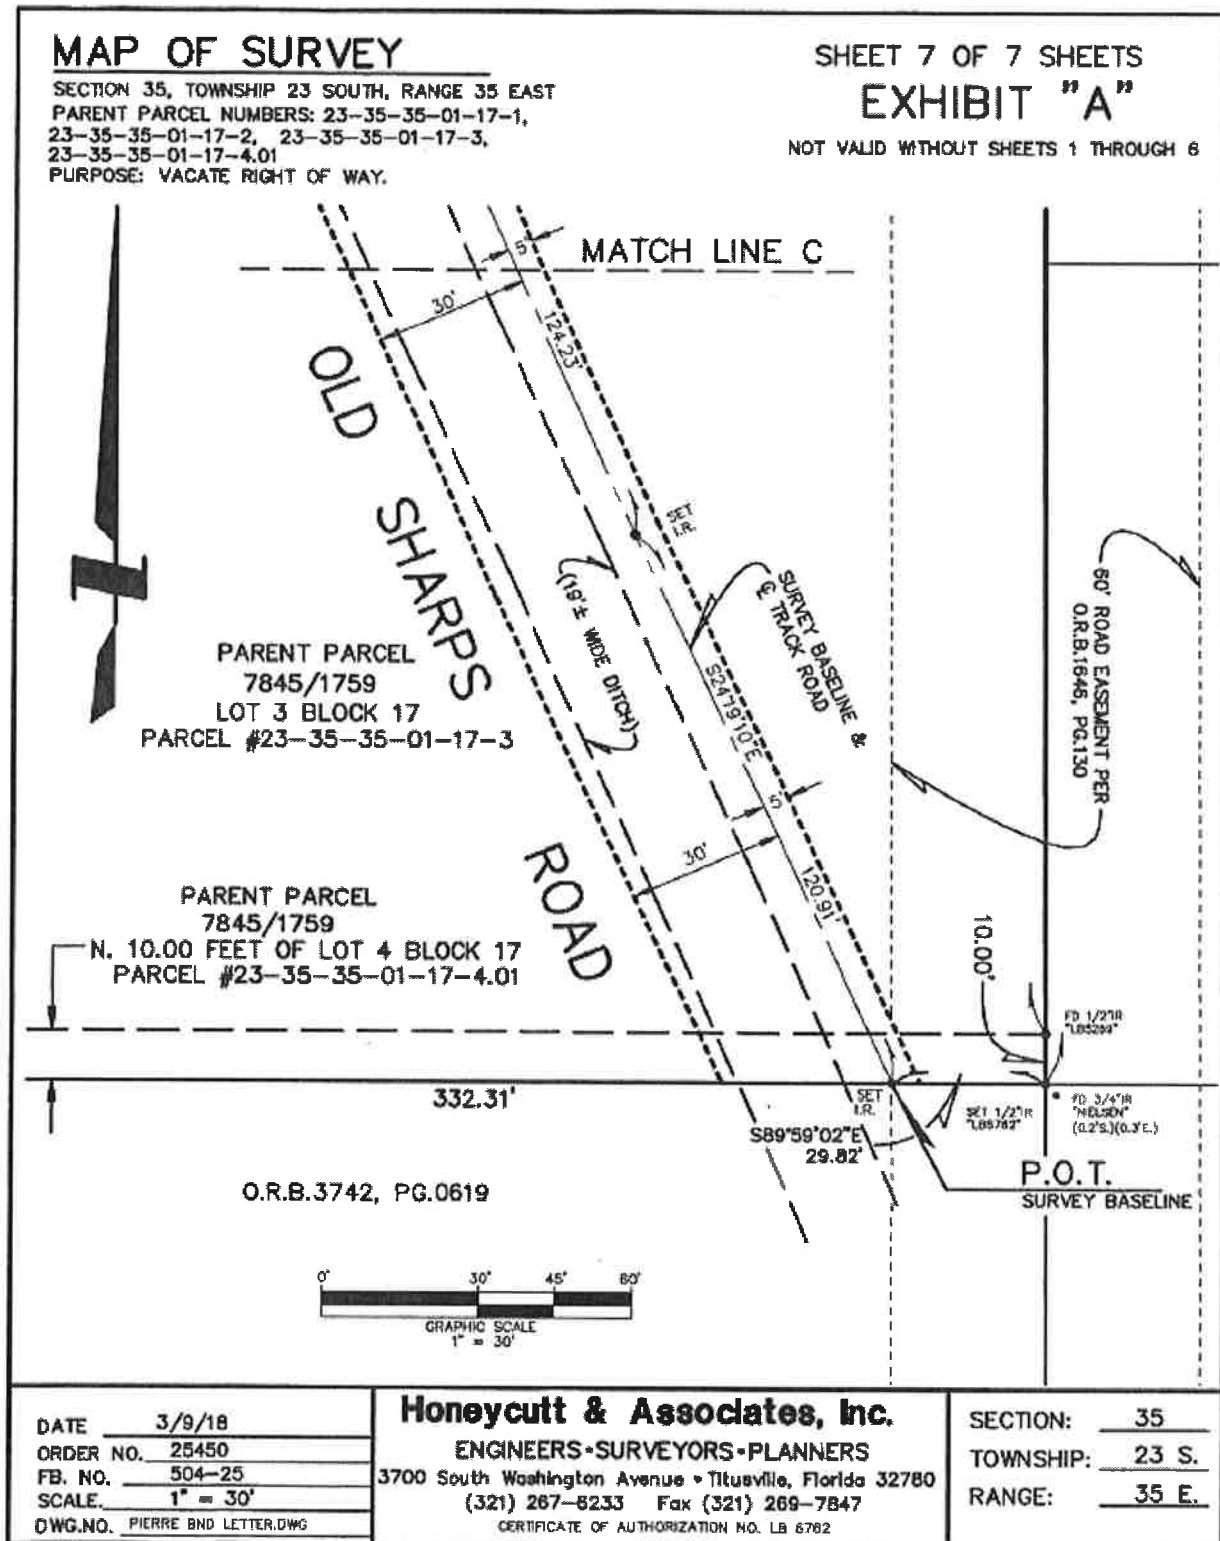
Copy of sketch sheet 7 of 7 of right-of-way Old Sharpes Road.
